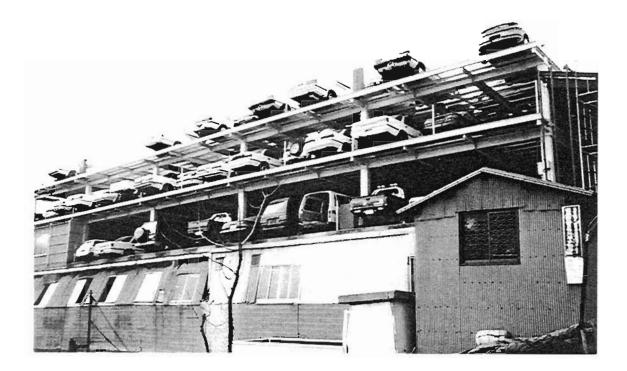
Flexible steel car park in port area above damaged ground floor office
